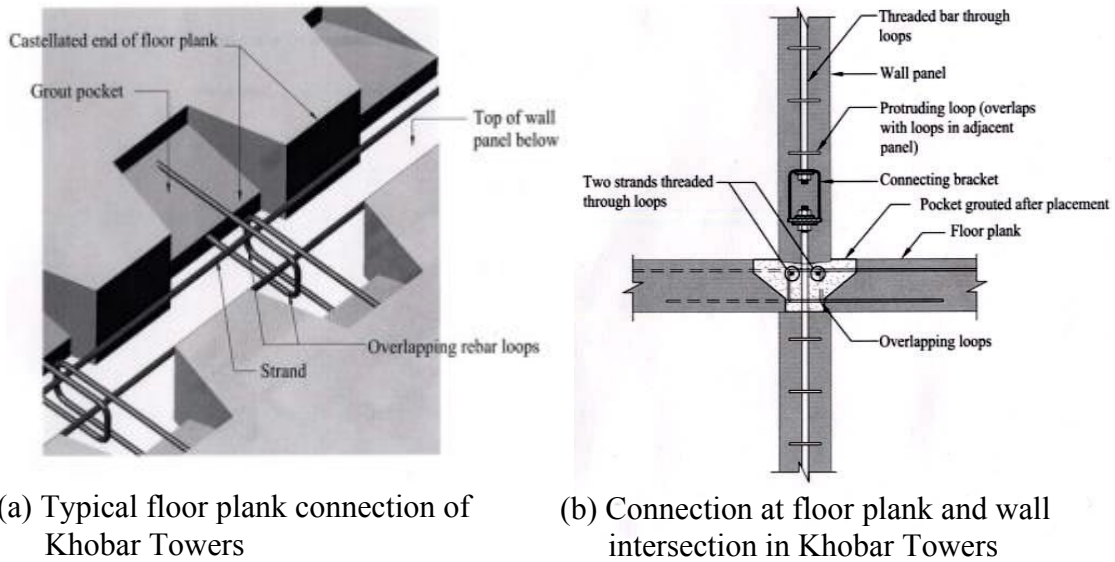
Khobar Towers connection at floor plank and wall intersection (Ellingwood et al., 2007)
